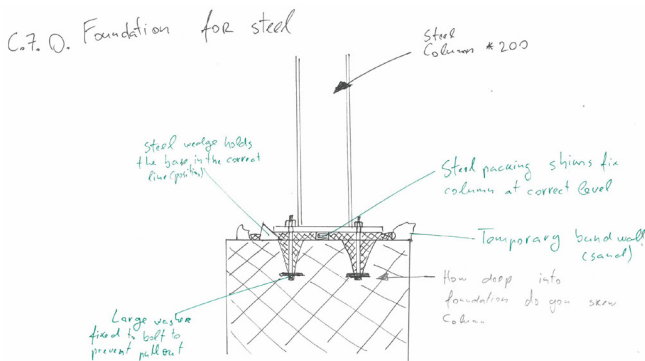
Sketch: Connection of the concrete foundation with the steel columns that support the extension
